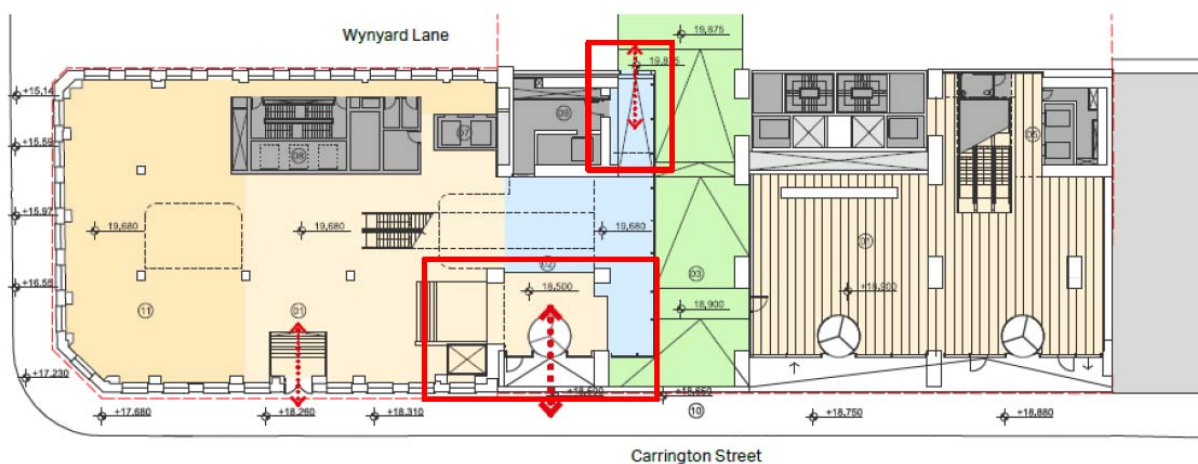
| Proposed ground floor layout (Source: Applicant's Modification Report)
